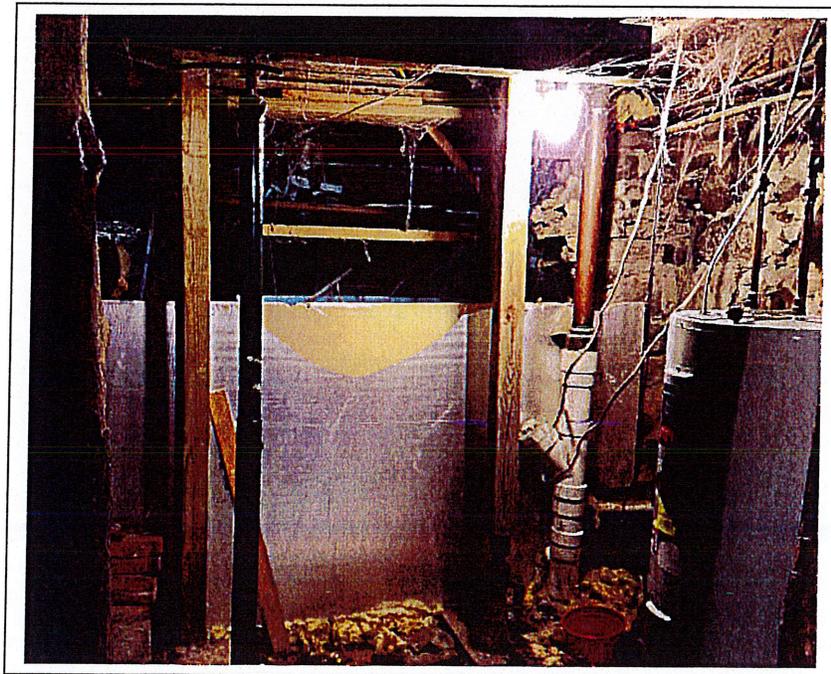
Portion of Foundation Wall (Log Constructed Portion) Removed by Previous Owner
